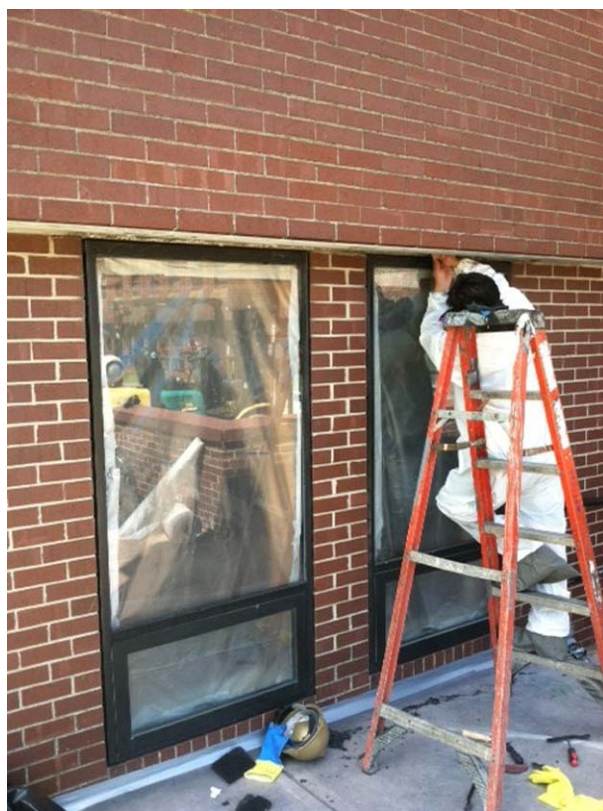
Removal of exterior PCB-containing caulk at perimeter of windows. *[Photo courtesy of EnviroScience]
